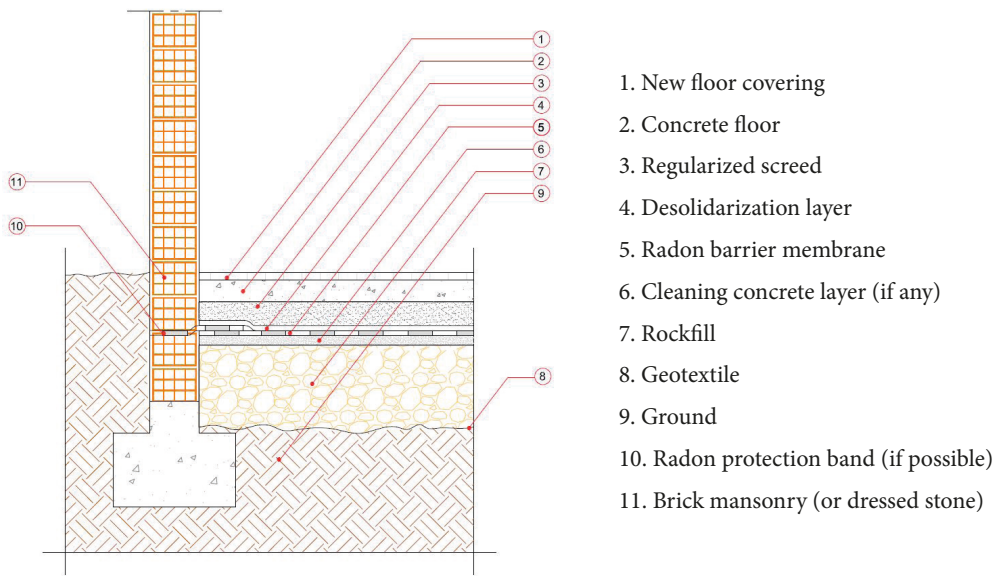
Membrane under the slab applied to the ground (new buildings)
